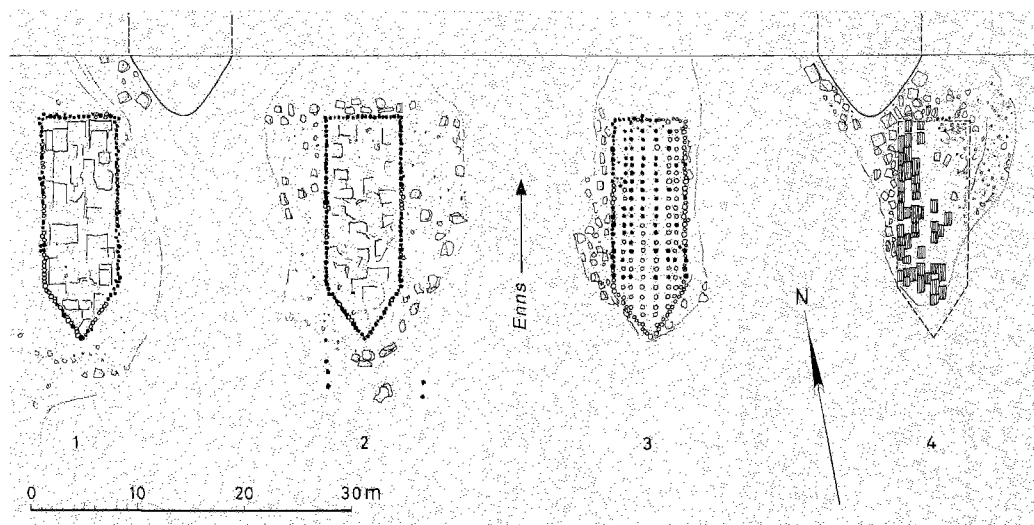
Plan of the four pier foundations of the 1856–1858 bridge at Ennsdorf. Piers 1, 2 and 4 were founded directly on the rocky substratum, pier 3 was founded on piles. All four piers had a cofferdam. The technique is completely comparable to Roman foundations.
